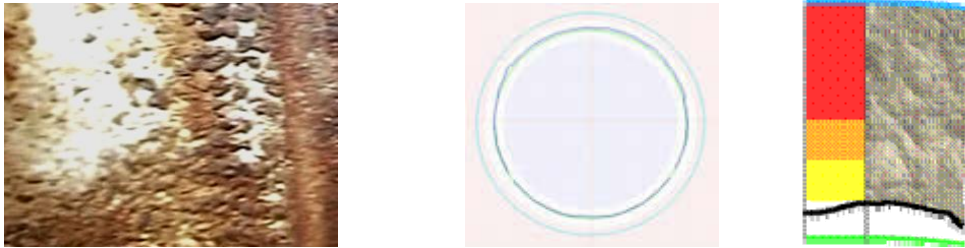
Laser profiling image above shows corrosion to 7 mm on pipe wall (Atlas Inspection Technologies, Inc. 2010).
